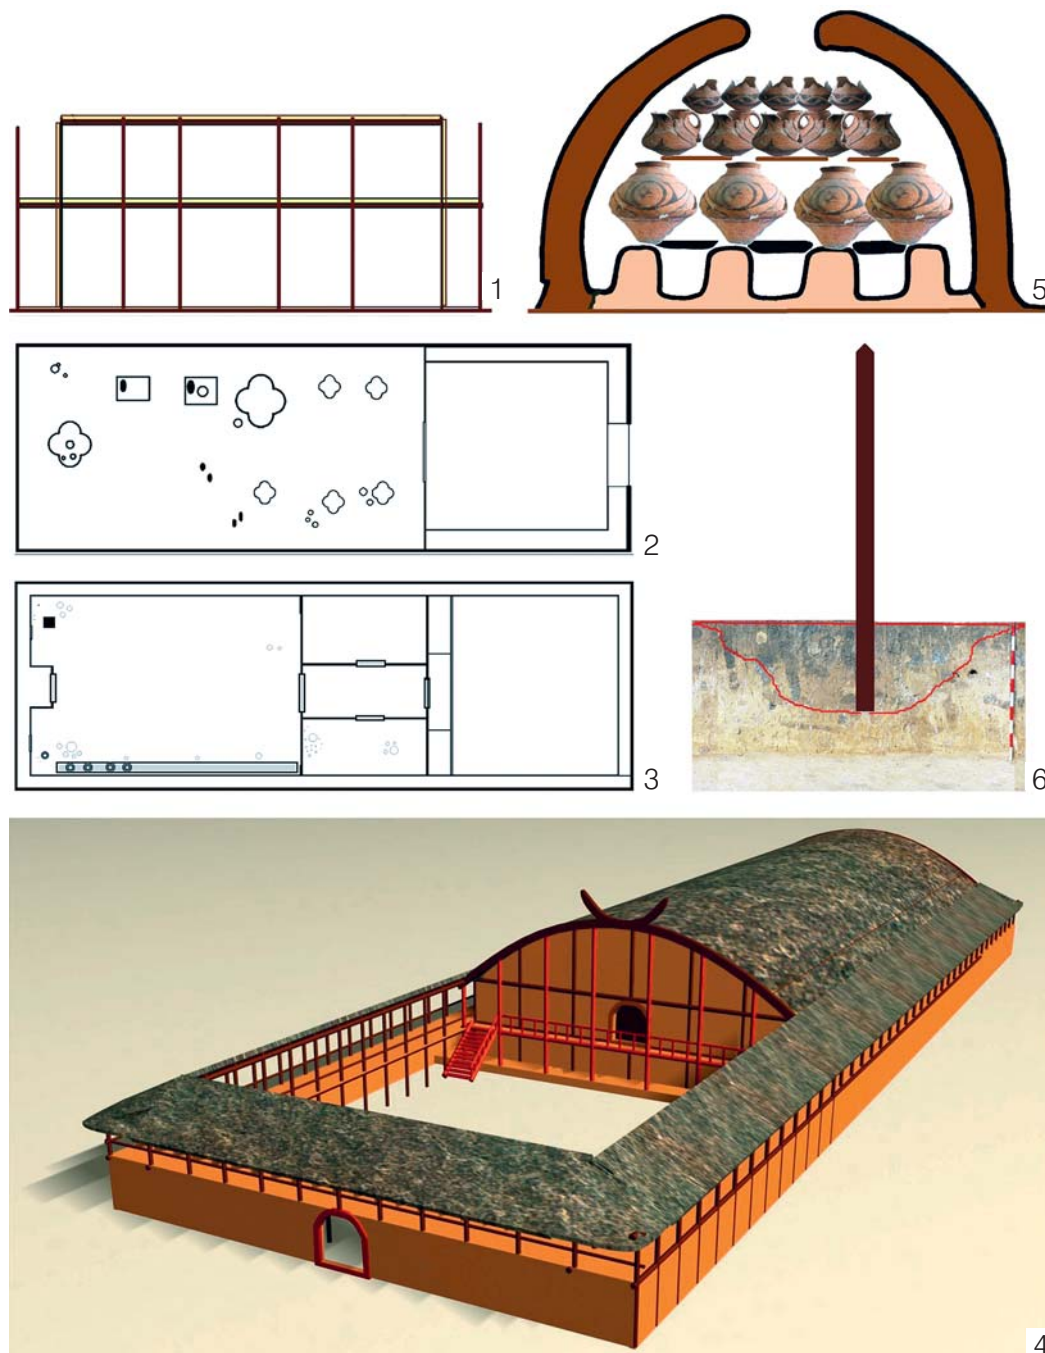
Nebelivka, reconstruction of investigated features: (1) frame construction of dwelling B5; (2) dwelling B5, plan of the ground floor; (3) dwelling B5, plan of the first floor; (4) dwelling B5, reconstructed as a temple (3D by M. M. Videiko); (5) profile of kiln; (6) profile of palisade.
